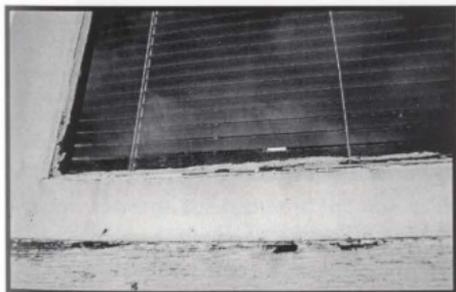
Mold growth on window sill and paint on glass lights, northern elevation.
